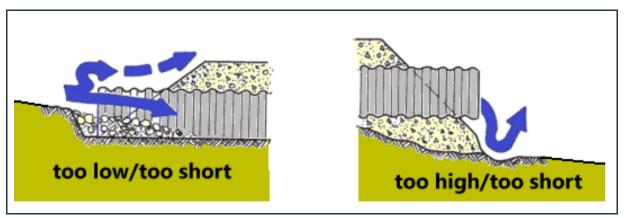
Typical installation problems/mistakes with culverts resulting in erosion and pipe clogging.
